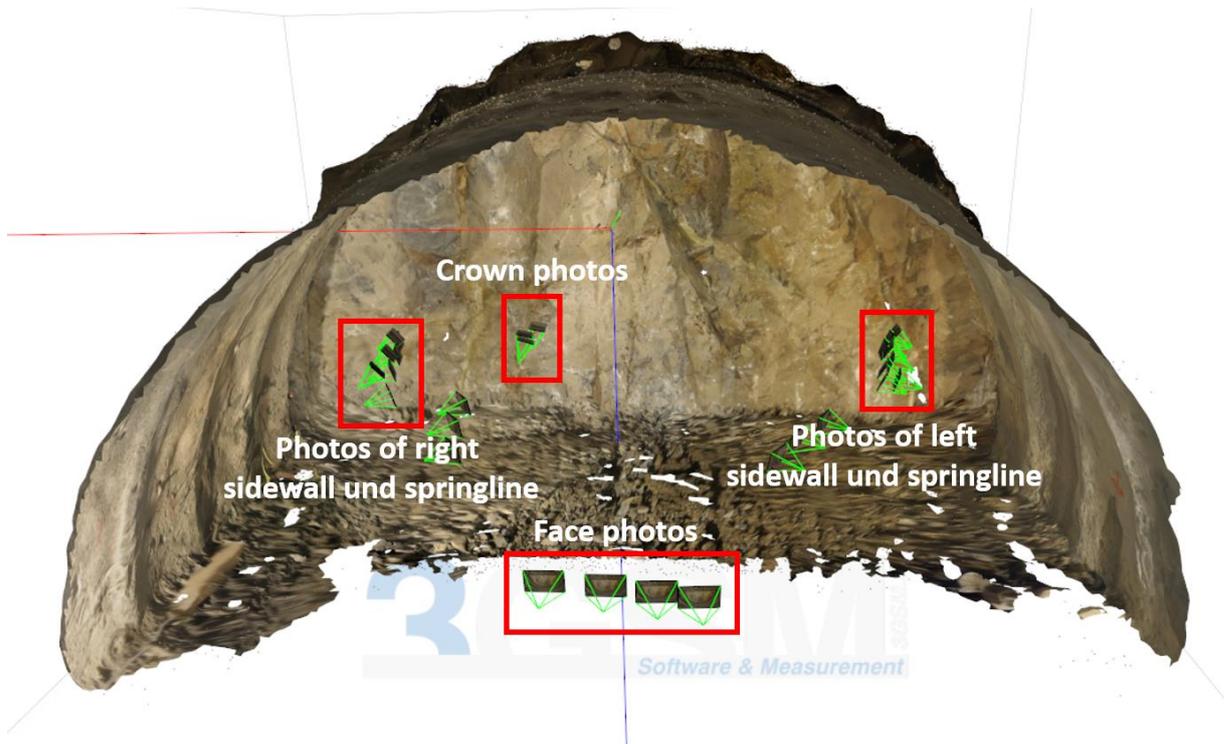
Example of image setup in tunnel – imaging the face, left and right sidewall and springwall and the crown – Part1
